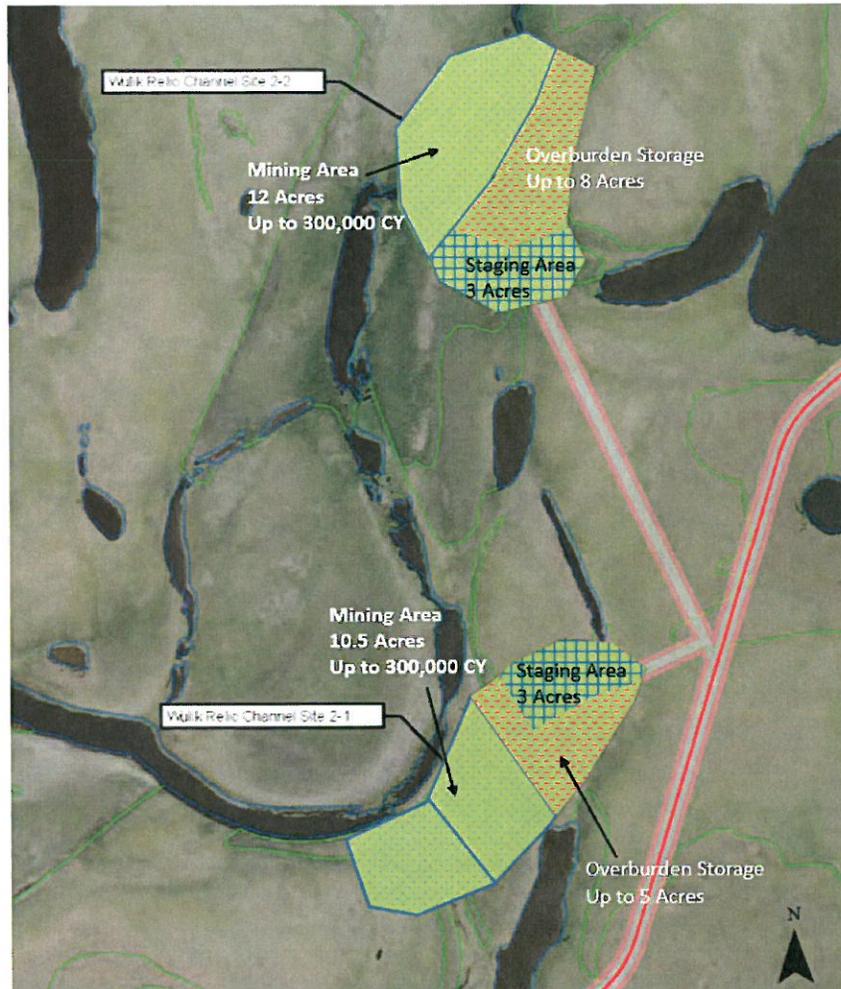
Wulik Relic Channel Sites 2-2 and 2-1—Site plan
